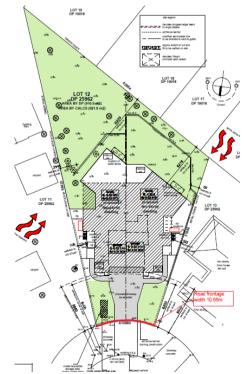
Site Plan depicting primary road frontage of 10.66m in red arc
